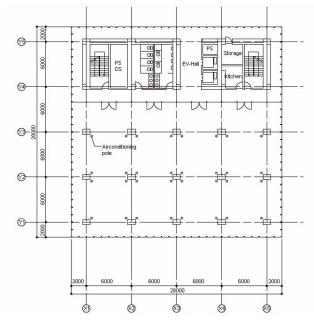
g - Ground floor; Dimensions in [mm]
